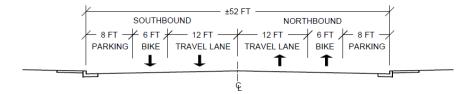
Proposed Typical Section between Vincent Street and Mercy Street
